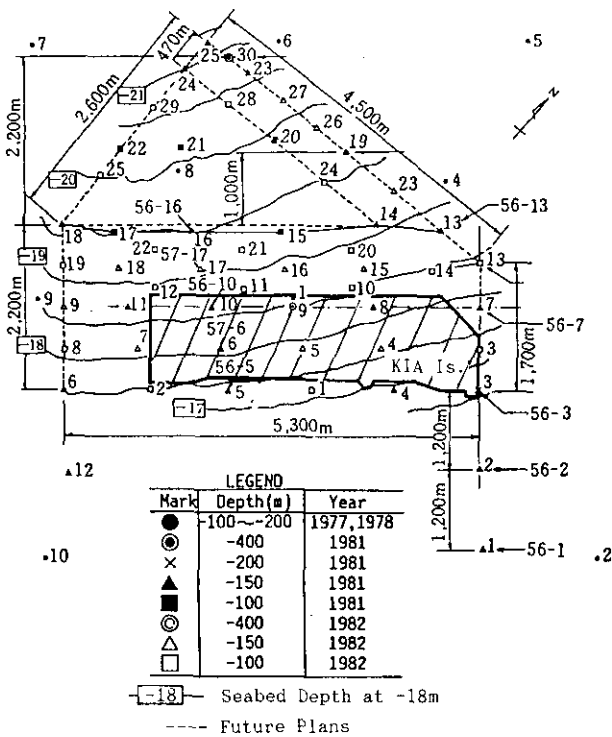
Project Site; Seabed Contours, Boring Locations and Future Expansion Plans (Kanda, et al, 1991)
